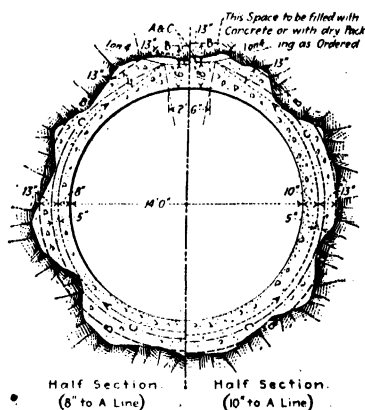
Concrete-lined pressure tunnel, Catskill aqueduct.
